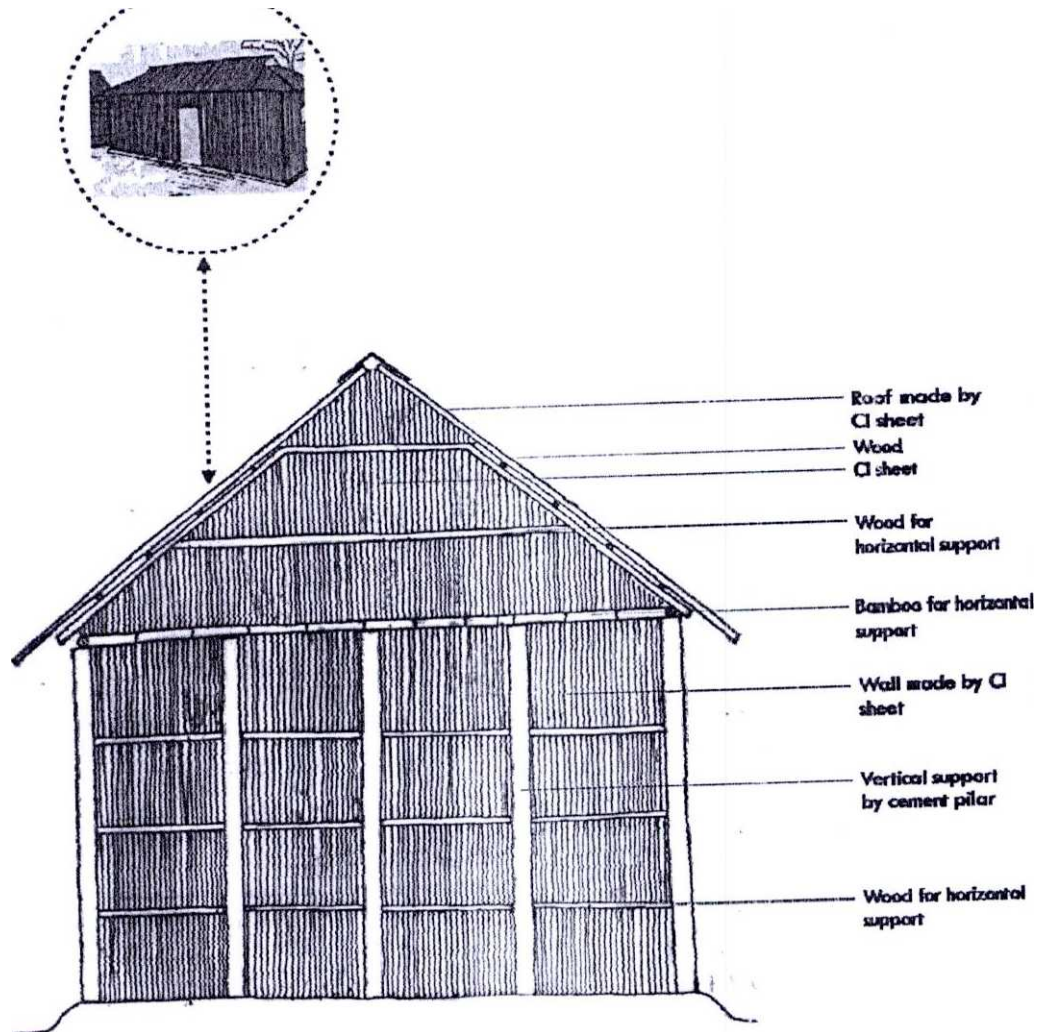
House made by Concrete pillar and CI (Corrugated Iron) sheet
